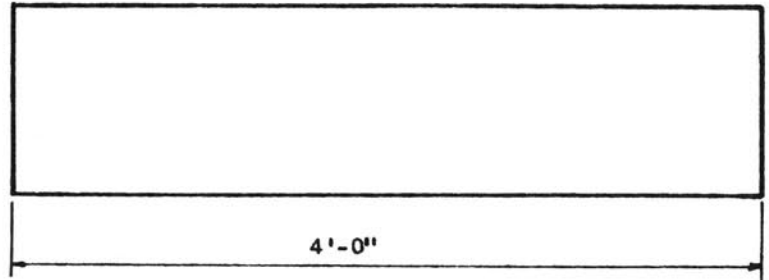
NOMINAL DIMENSIONS OF TEST SPECIMENS
